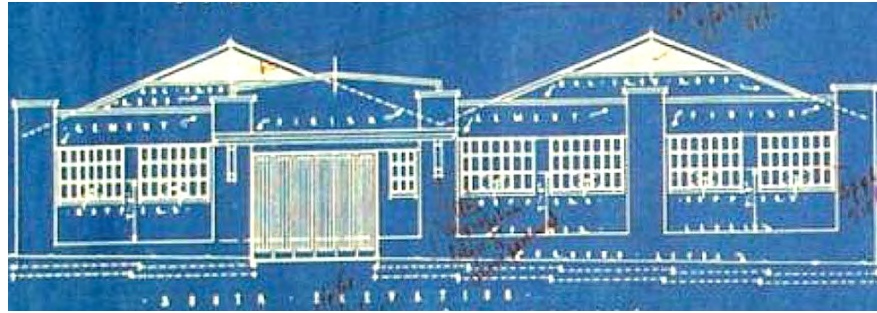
The front elevation of 160-170 Pelham Street as shown on the 1928 permit drawings.
